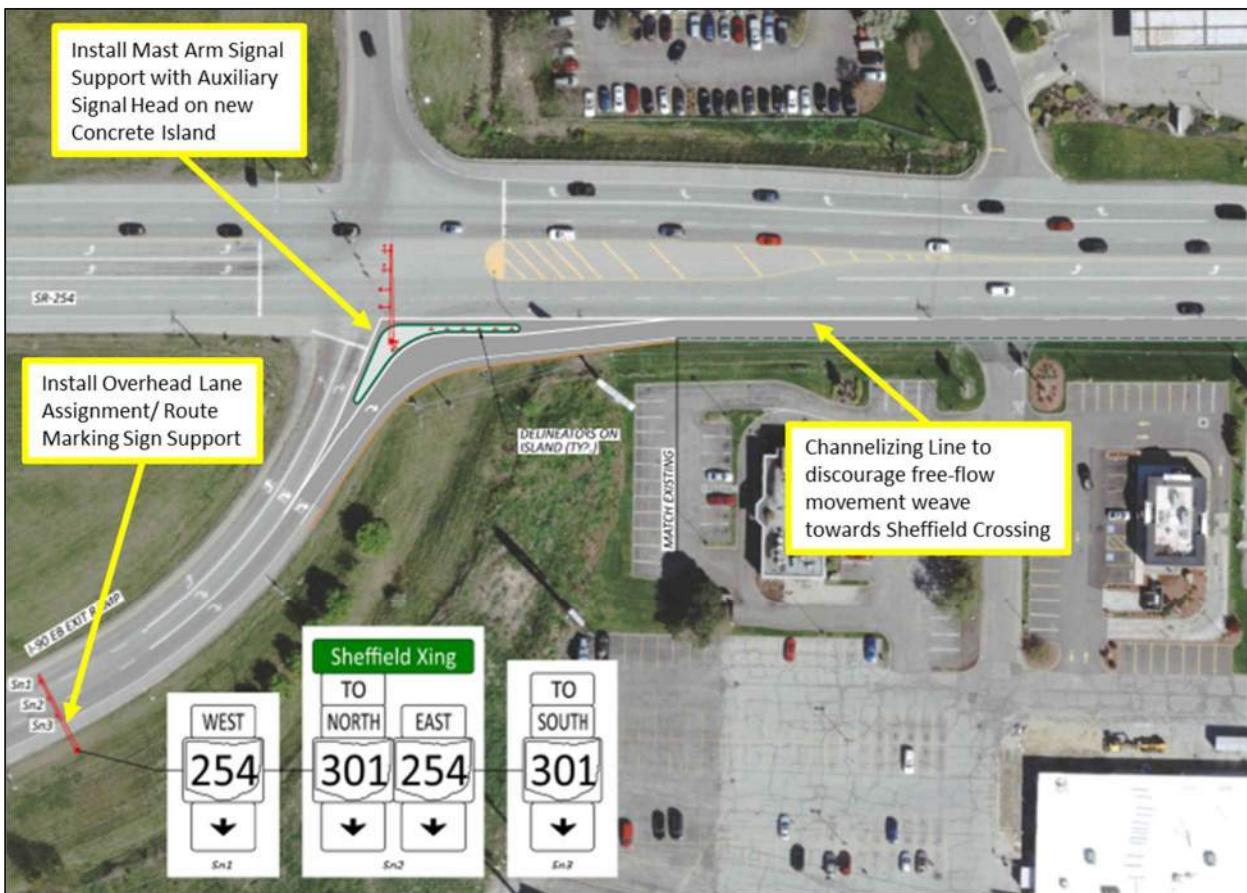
PROPOSED WORK AT EB I-90 ENTRANCE RAMP AT SR-254
